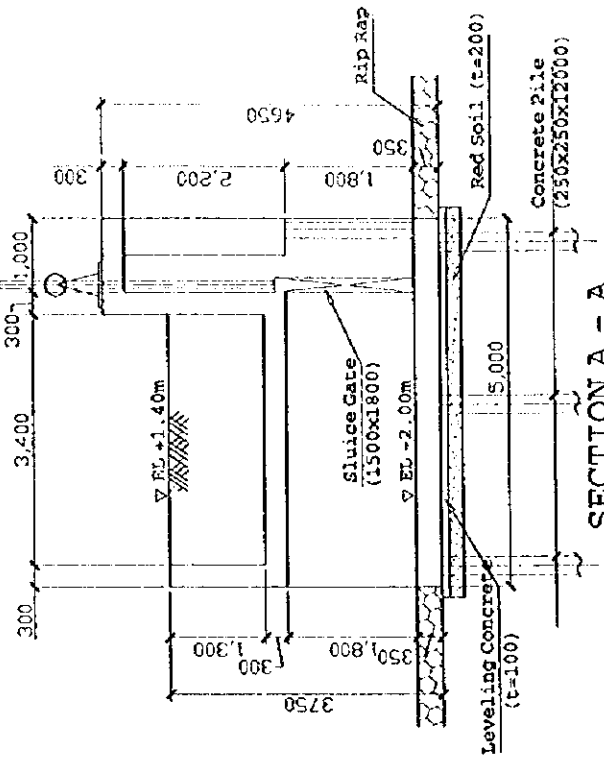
(2/4) LAYOUT OF PROPOSED RETARDING POND OF BEN ME COC (1) PUMPING STATION
